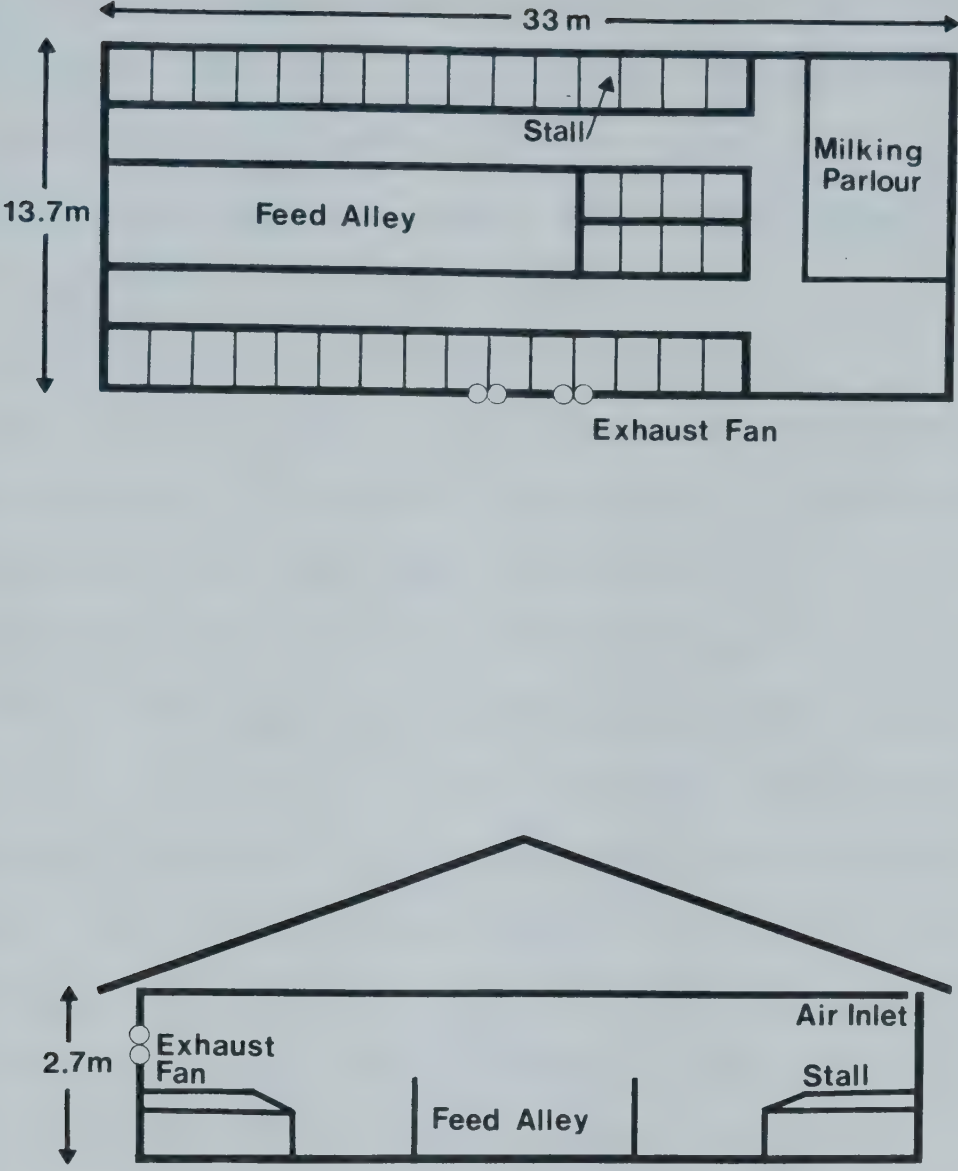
Barn SO-3 – floor plan and cross-section.
